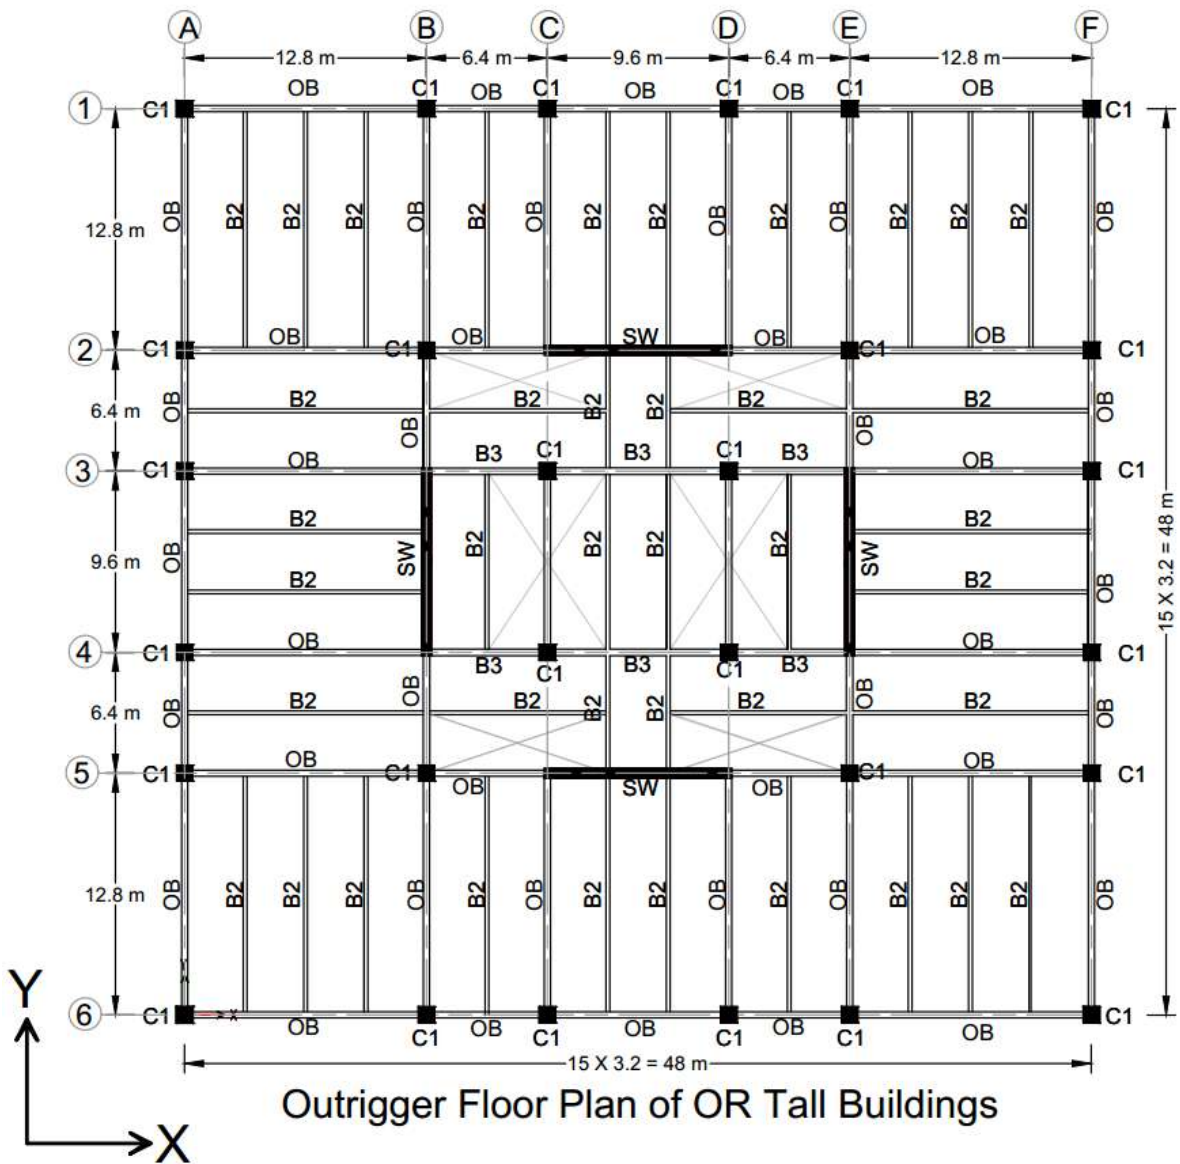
Outrigger Floor Plan of OR Tall Buildings
